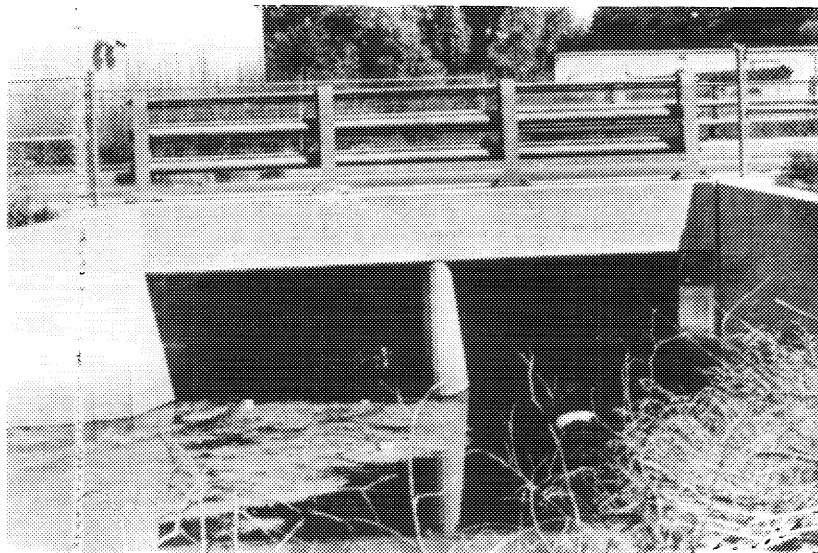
WATER STREET BRIDGE - MILL RIVER
